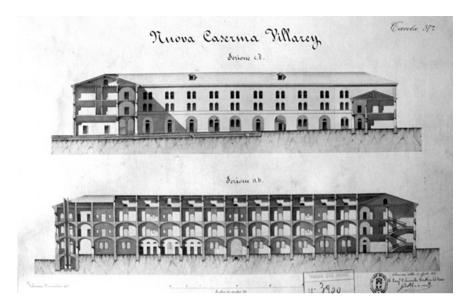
Bernardini (1868). "Nuova Caserma Villarey. Tavola 37^a. Sezione CD; Sezione AB. Scala 1:200" (New Villarey Barracks. Plate 37. Section CD; Section AB. Scale 1:200)
